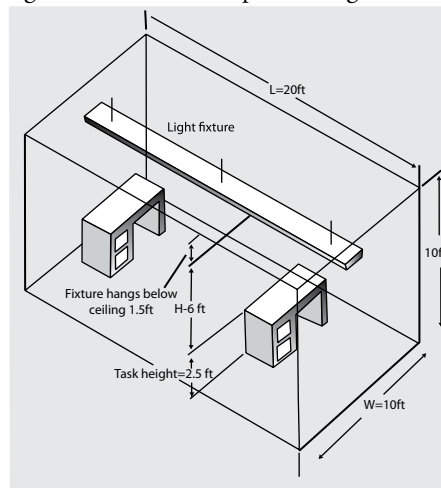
Example for Room Dimensions, Placement of Lighting Fixture, and RCR Calculation
